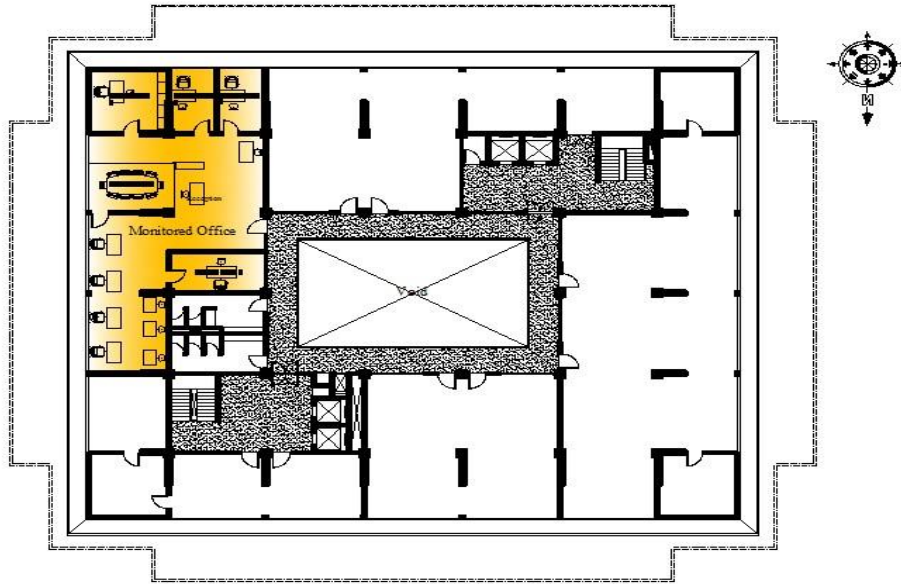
Schematic plan of offices on the 5th floor in the P. T. Building
